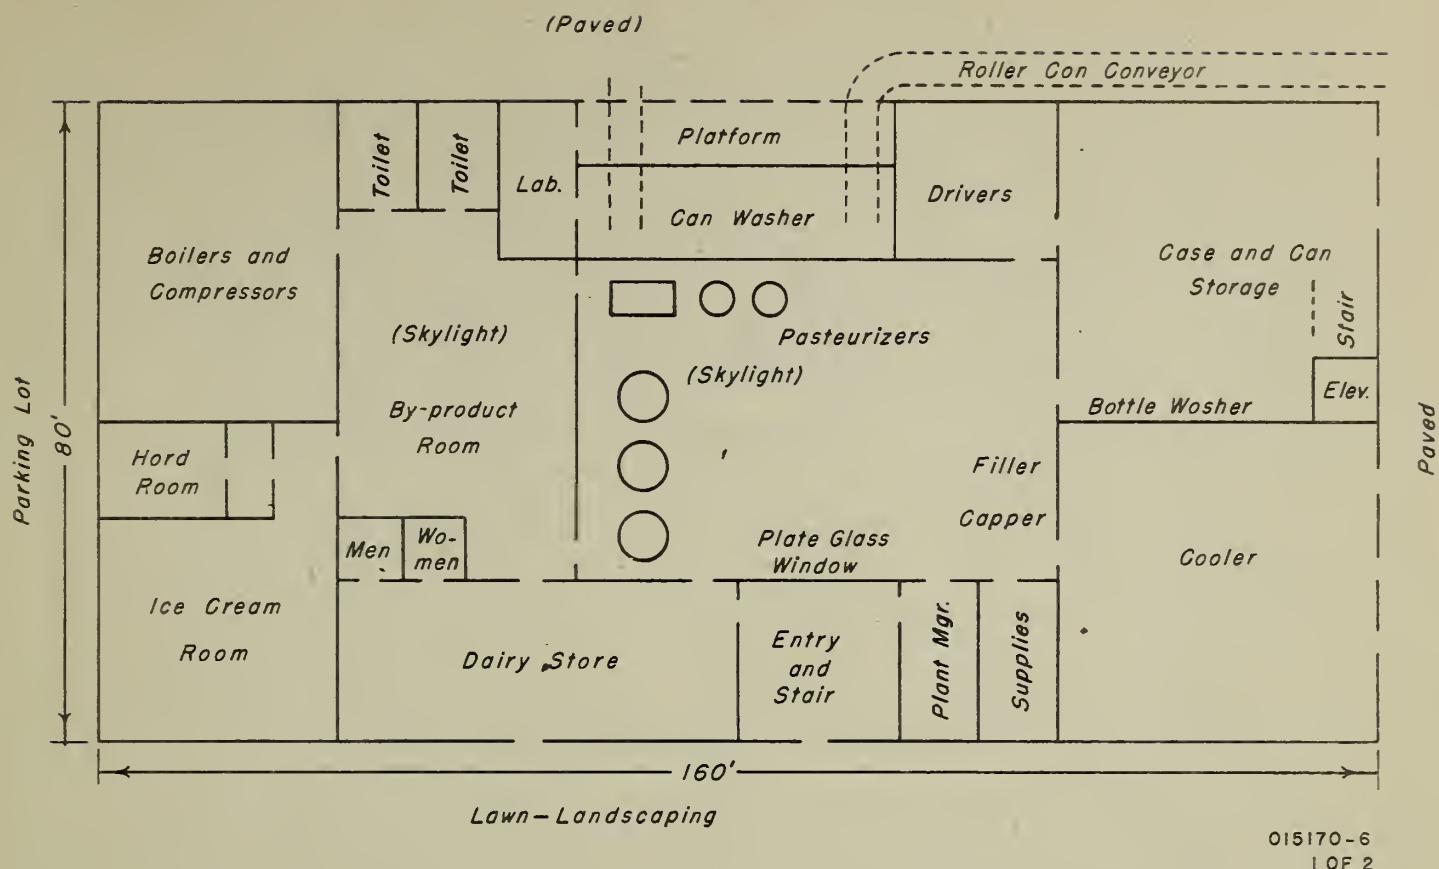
Suggested floor plan for milk-pasteurizing plant of 7,500 to 10,000 gallons capacity. (First floor.)
